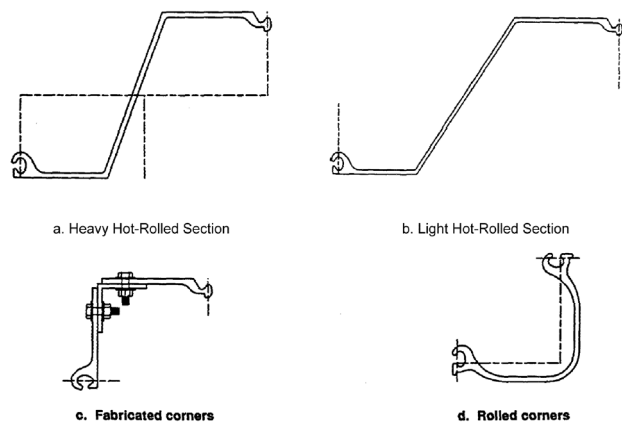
Typical Hot-Rolled Steel Sheet Piling
